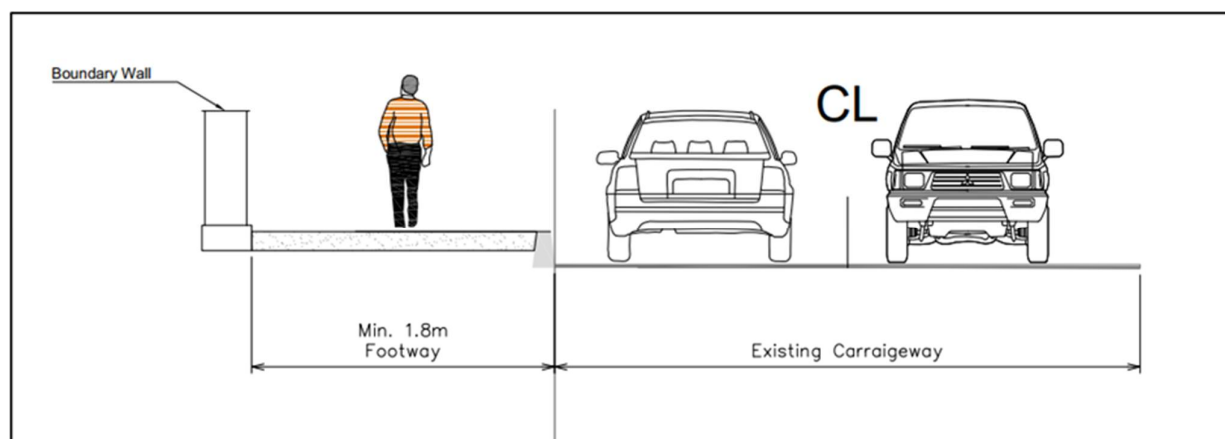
Preferred Option Section 1 (i) - Minimum 1.8m footway on northbound side
